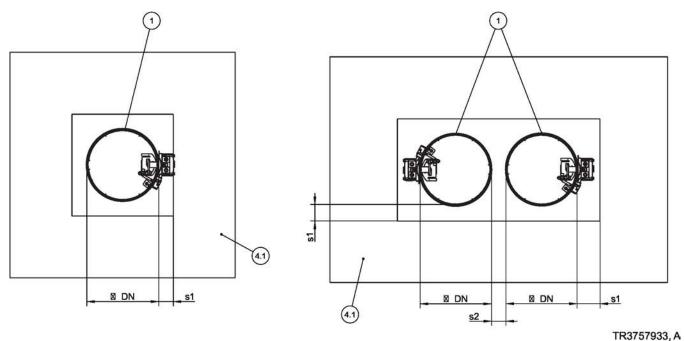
Solid ceilings – arrangement / distances, side-by-side arrangement by way of example
